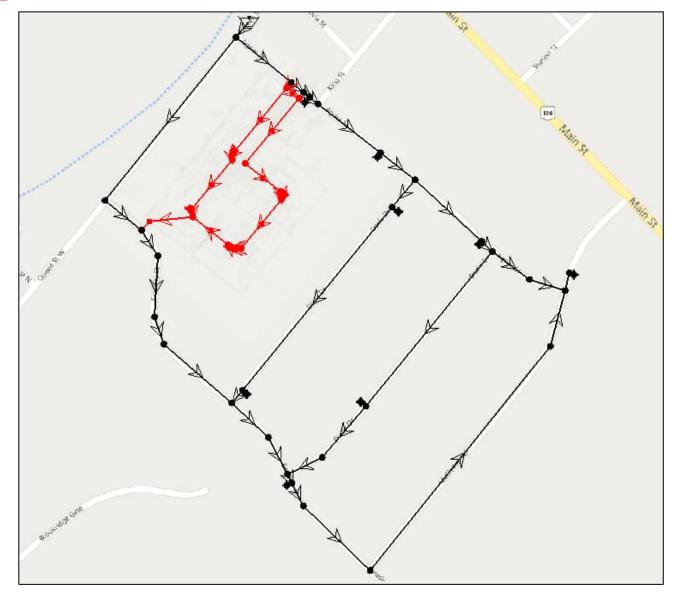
Agnes St Subdivision Site Layout Highlighted in Red
